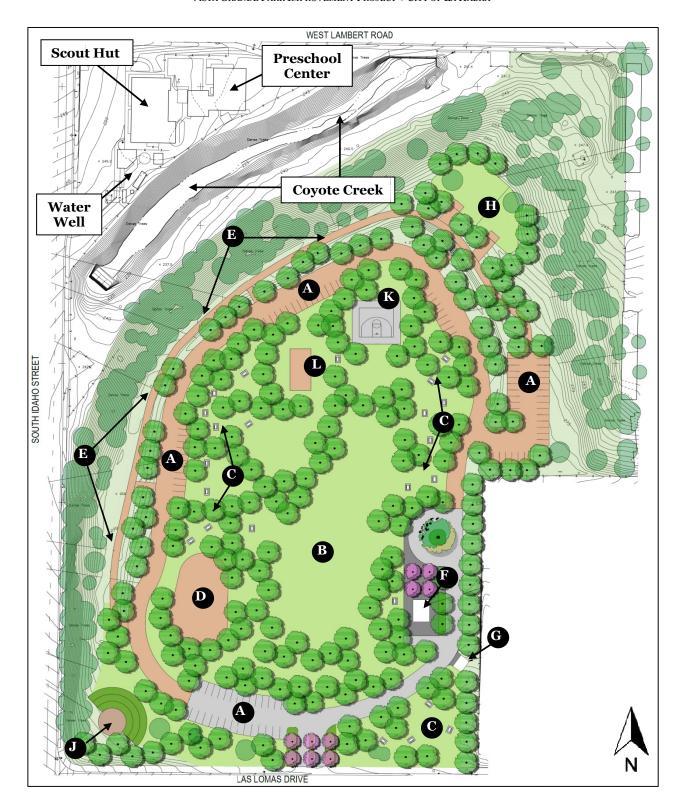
CONCEPTUAL SITE PLAN (ALTERNATIVE B)
